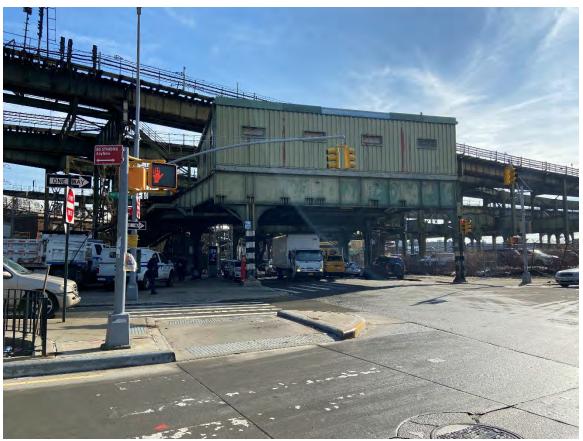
Facing south from the east sidewalk on Van Sinderen Avenue to the location of the proposed new elevated A/C to L transfer bridge.
